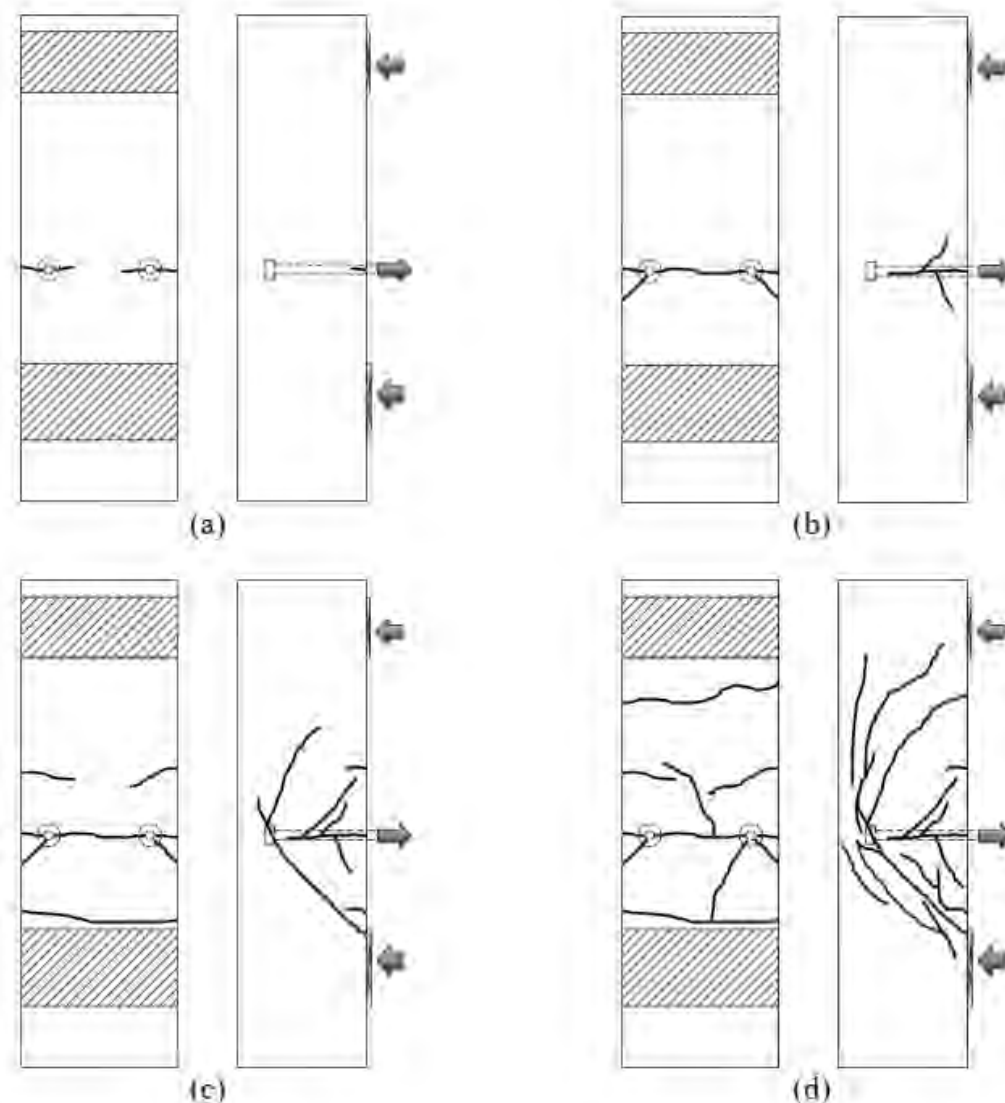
Crack progression observed in the beam-column joint specimens containing headed bars. Breakout failure is preceded by bond slip along the straight portion of the bars and cracking of the concrete (Shao et al. 2016, Ghimire et al. 2019a)
